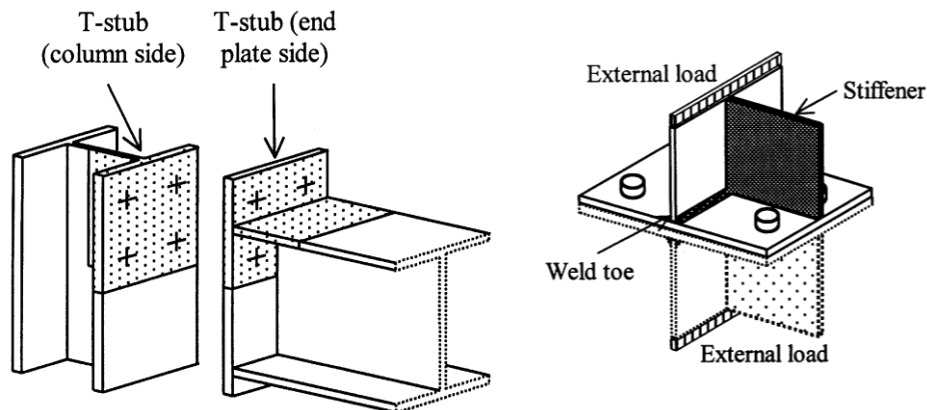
Different types of bolted T-stub connection assemblies[49]
